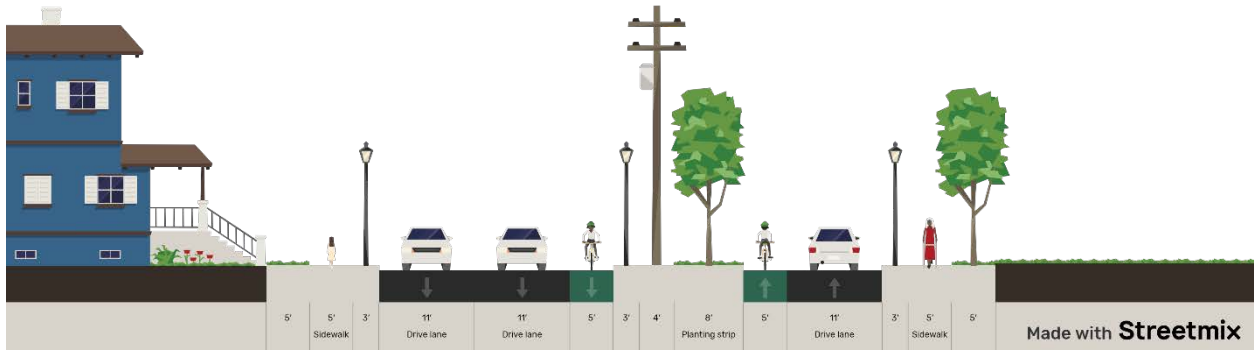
The street cross-section of W 57th St and the park is 100m from the street. This street has a wide median with a planting strip, one driving lane on the right, and two driving lanes on the left. To reduce the vehicular speed by slightly decreasing the drive lane width. And the reduced center median space accommodates bike spaces on both sides. Adding landscaping on the right to enhance the walking environment. Diagram created in Streetmix by EC, 2023.
